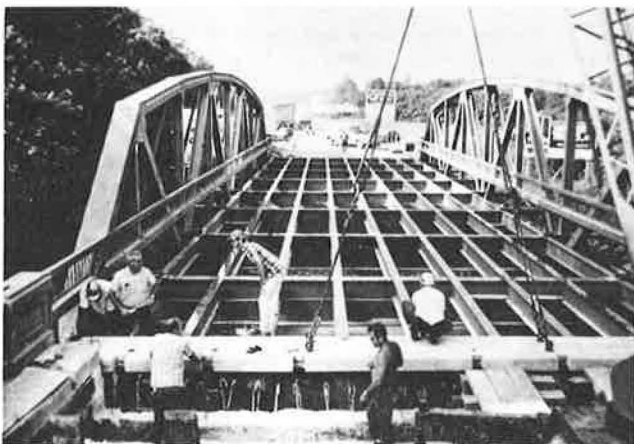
Precast, prestressed deck elements are positioned directly from delivery truck.
